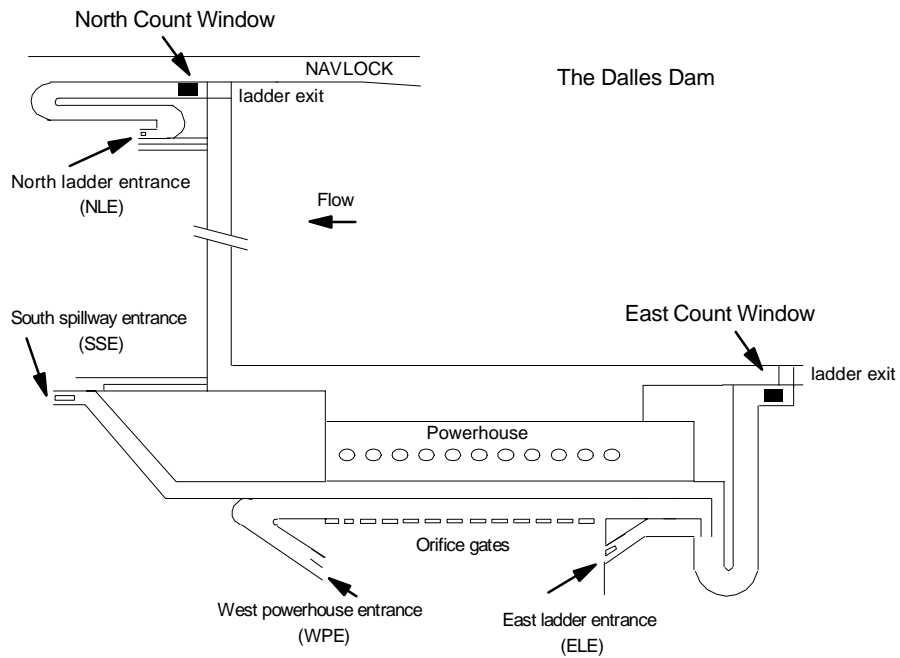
Location of count windows in the north and east fish ladders at The Dalles Dam.
